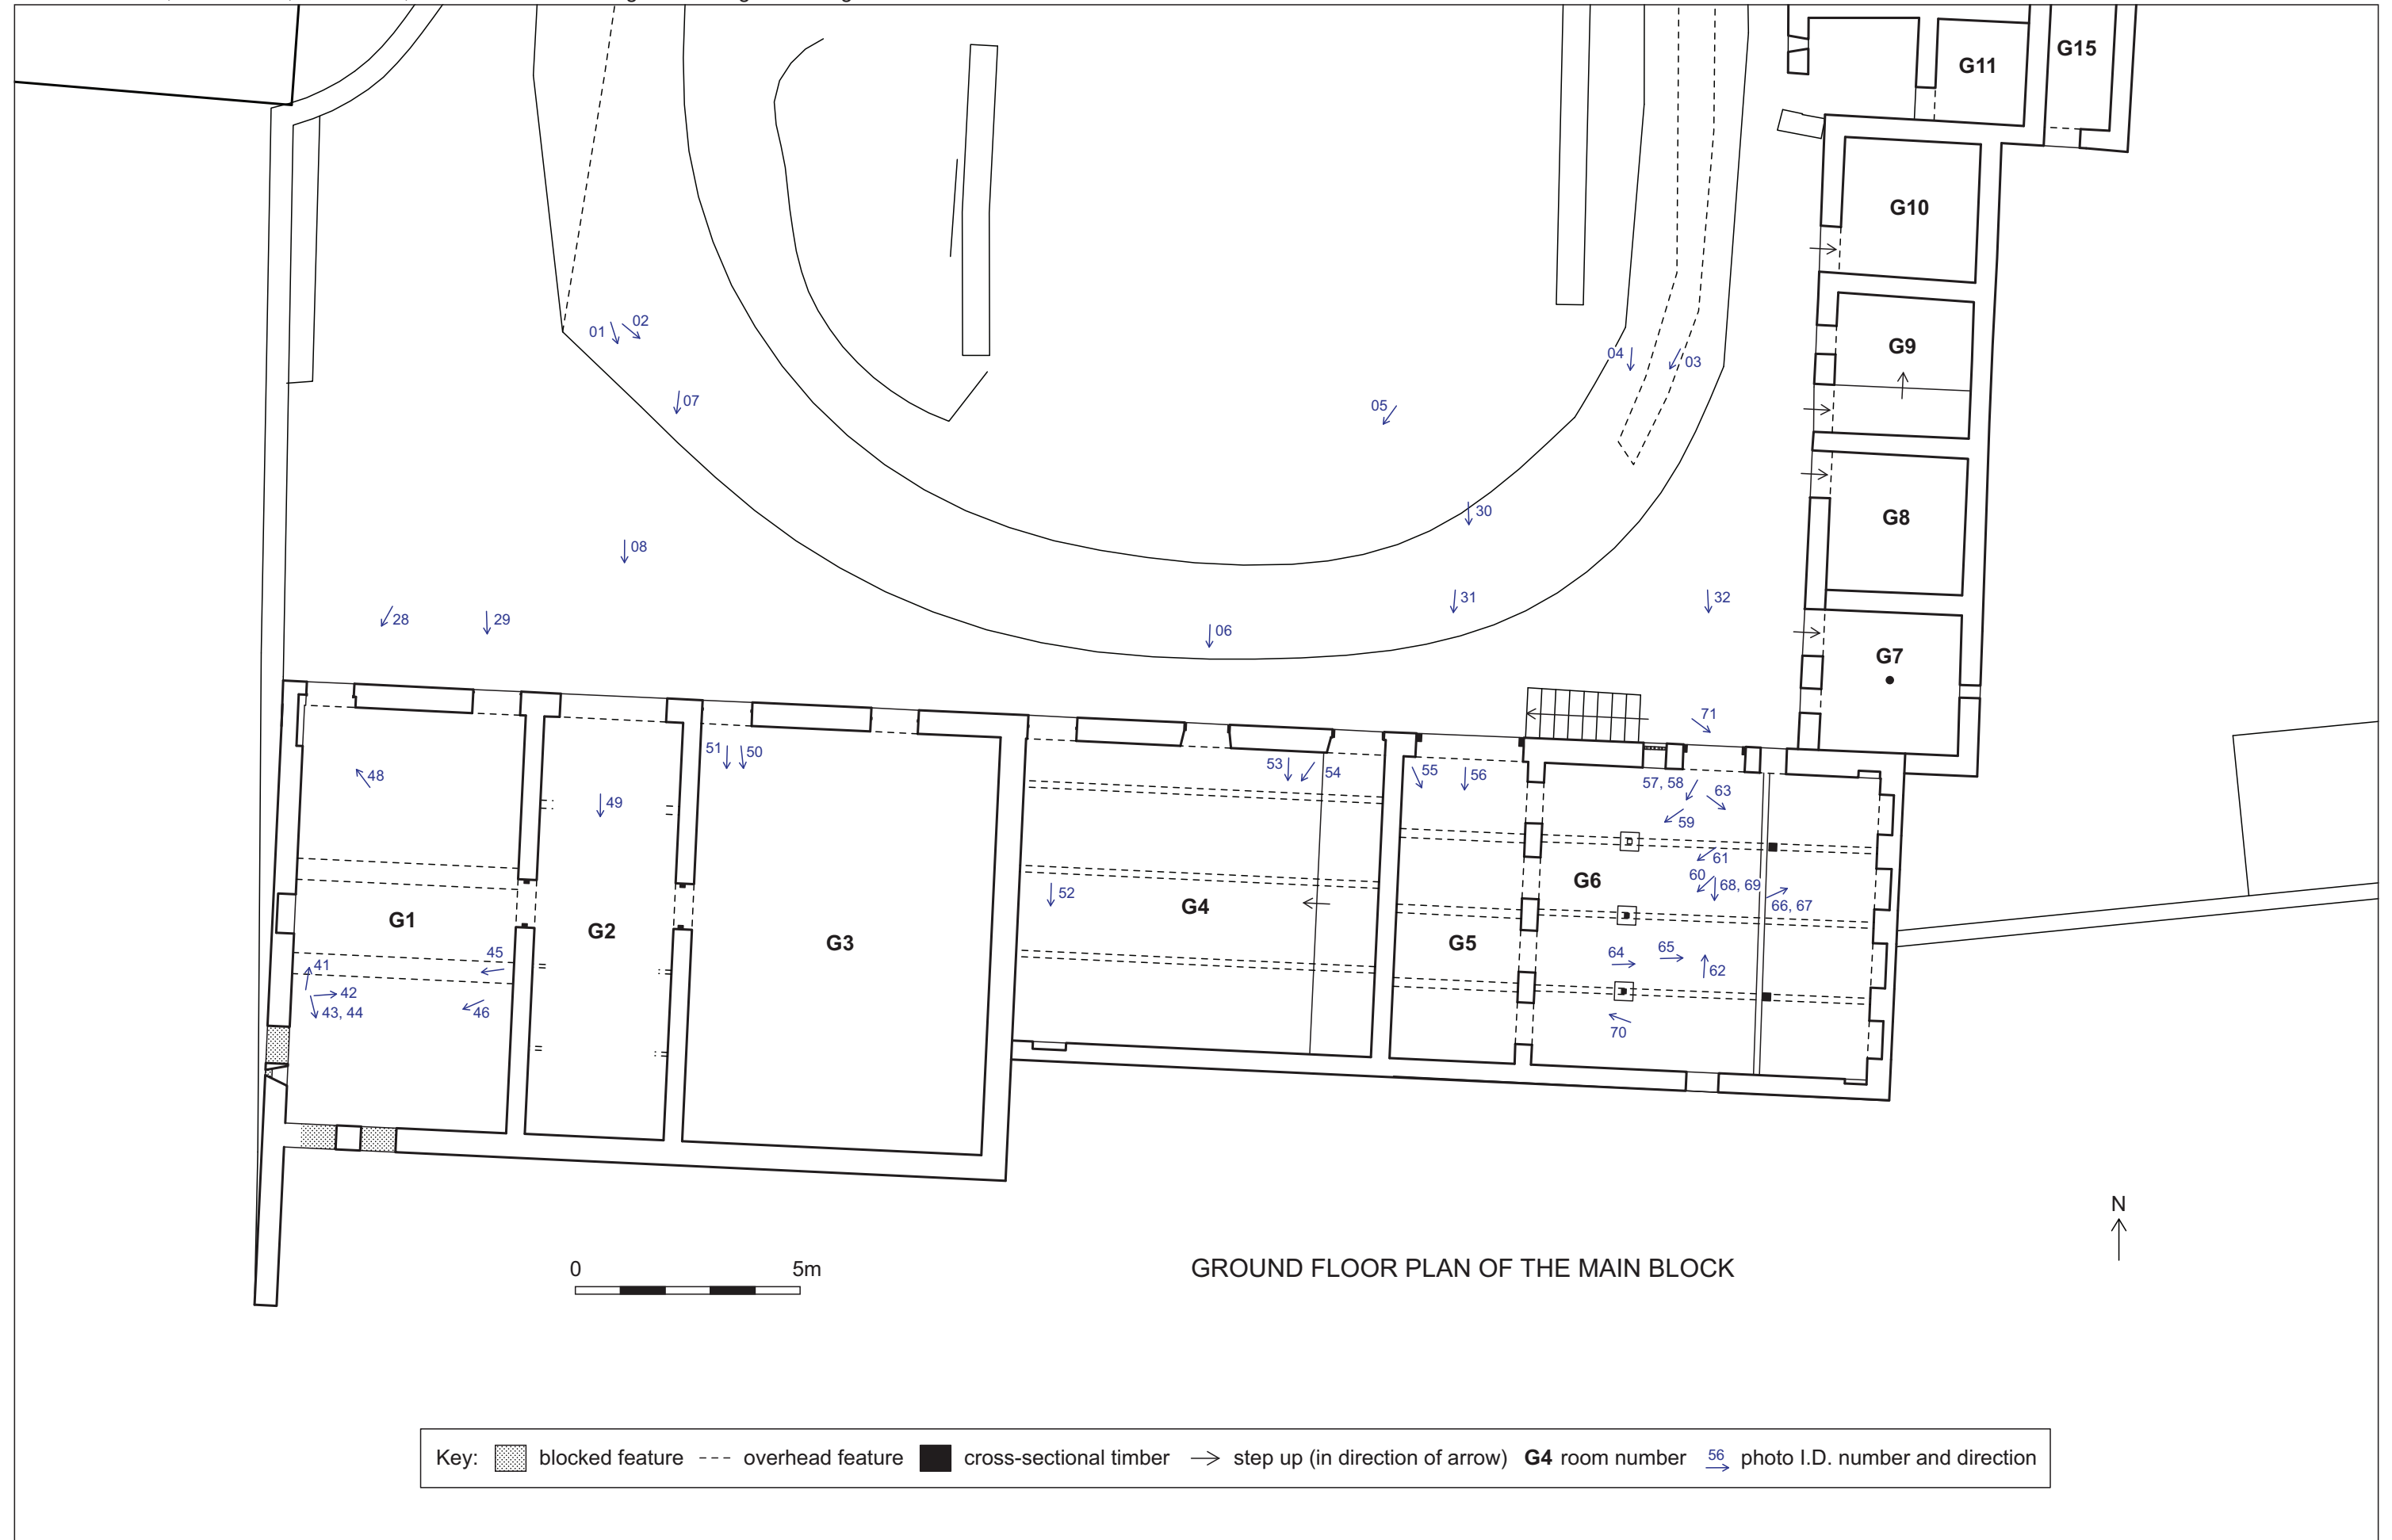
Ground floor plan of the main block, showing the location of photographs taken
